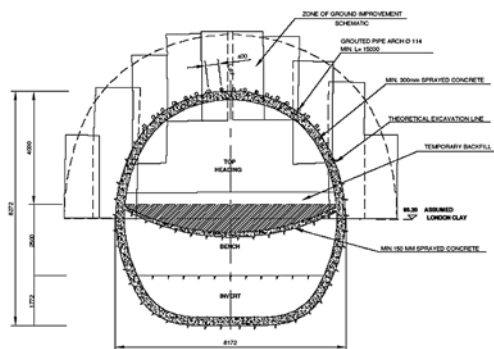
Schematic excavation cross section with secant jet grout columns and grouted steel pipe arch
